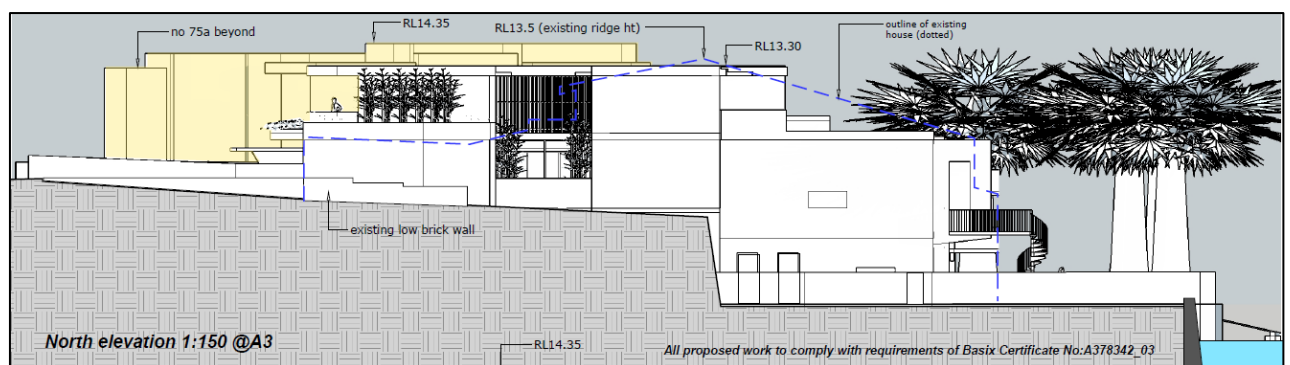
Northern elevation of proposal (existing dwelling shown in blue dotted line)
